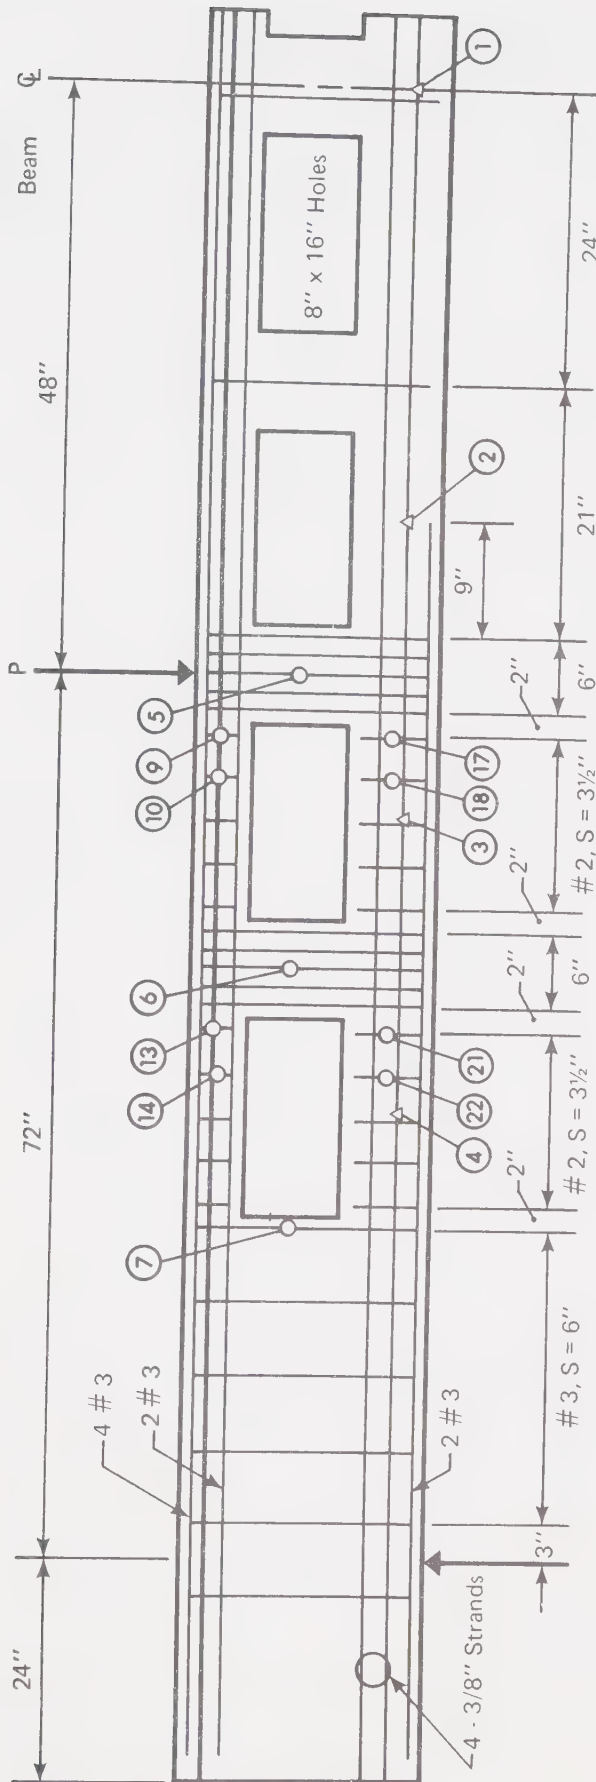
Reinforcement Details and Strain Gage Locations for Beam 6-16-6
